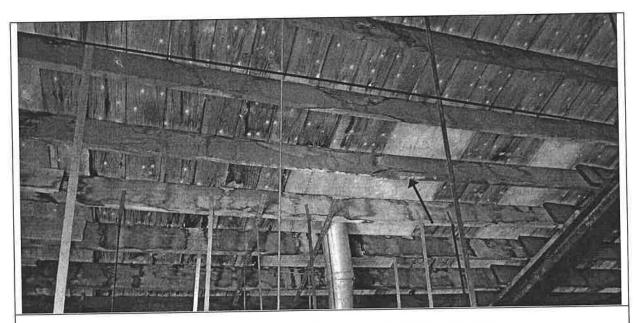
Roof Joists on Sloped Roof: Note significant deflection (typical), and cracked joist at arrow.
